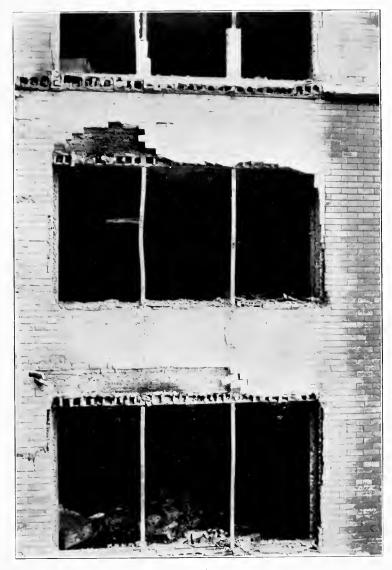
EAST WALL OF COURT, 13TH, 14TH AND 15TH FLOORS. NOTE DAMAGE TO TERRA COTTA BRICK.
